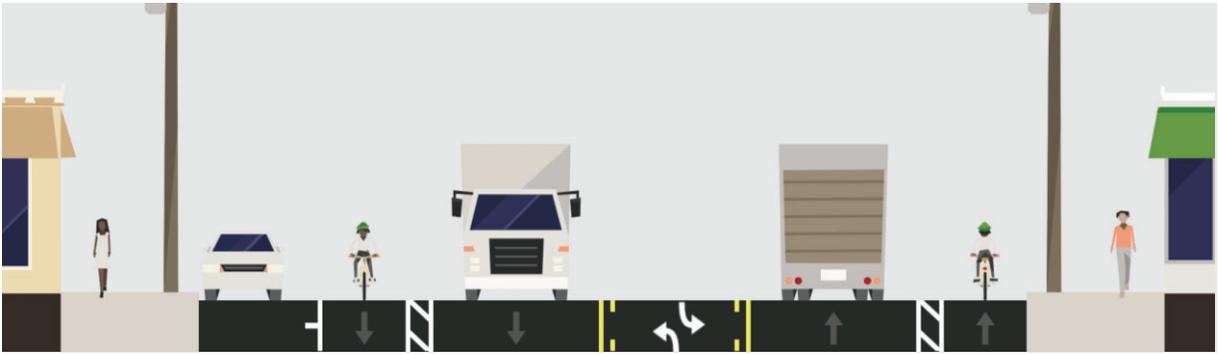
Proposed Cross Section of Evans Avenue between Quint and Phelps Streets, looking west
